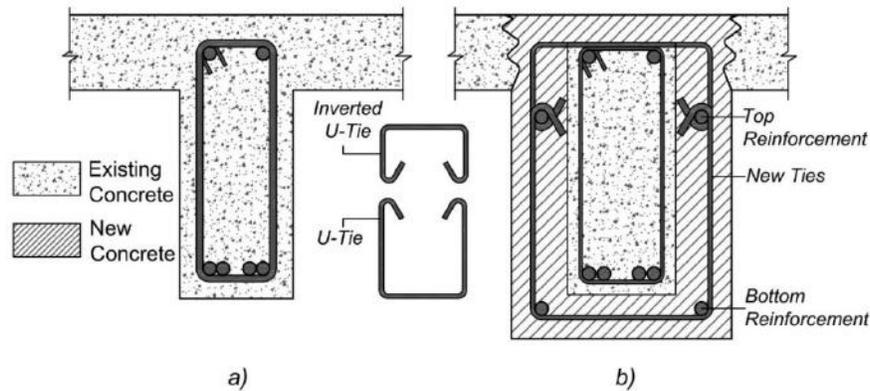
Cross-section and reinforcement for a RC beam with an RC jacket: a) existing beam section and b) retrofitted beam section (based on Alcocer, 1993).
